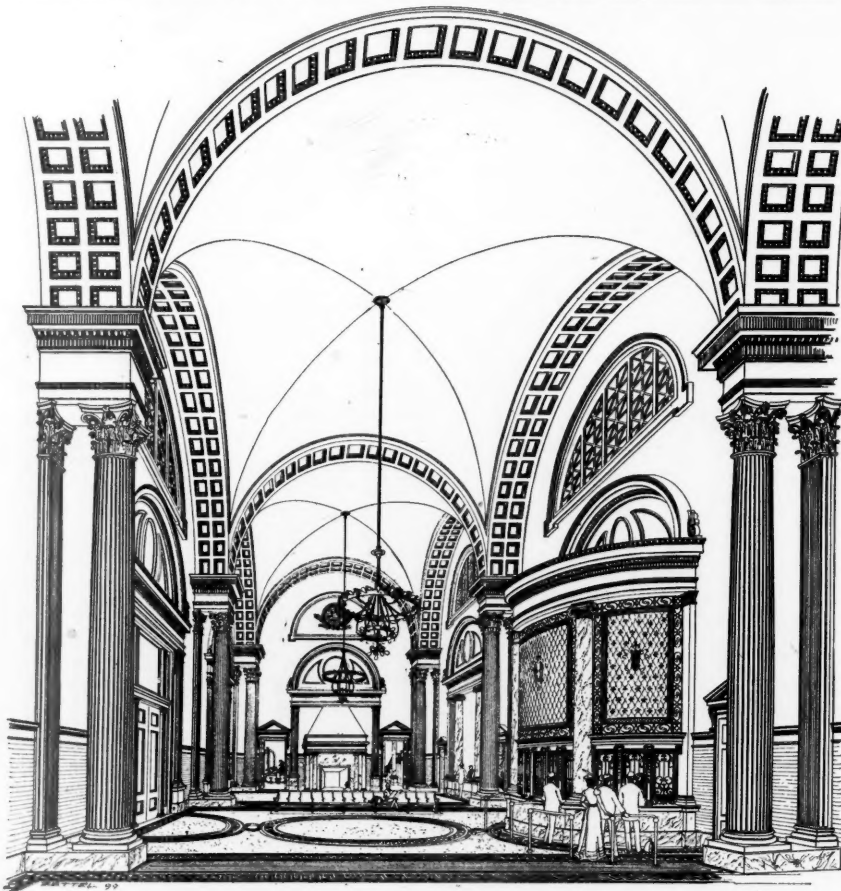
Dayton Union Station—Main Waiting Room, Looking West.
